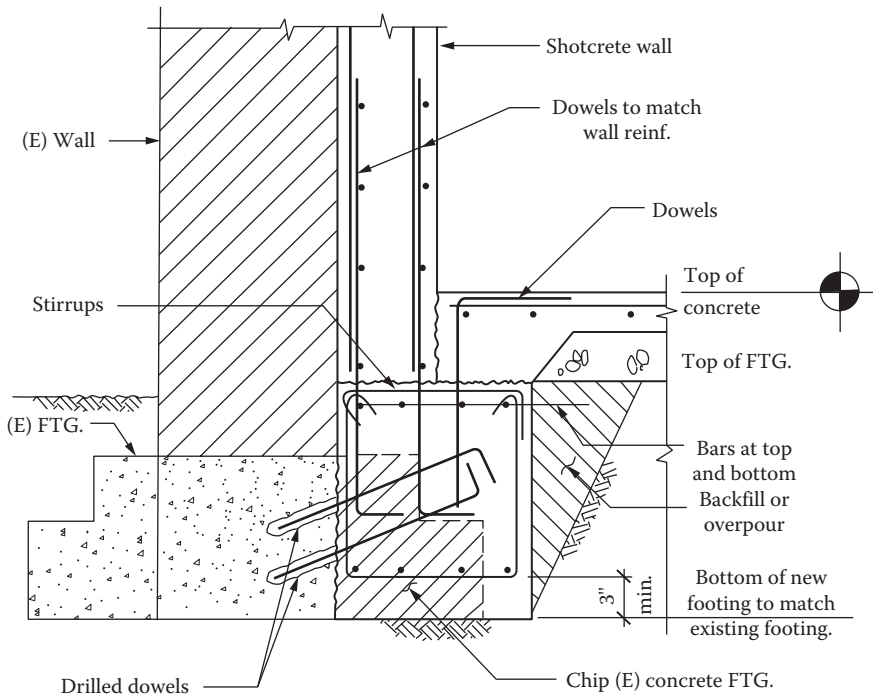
New concrete strip footing next to existing strip footing.
